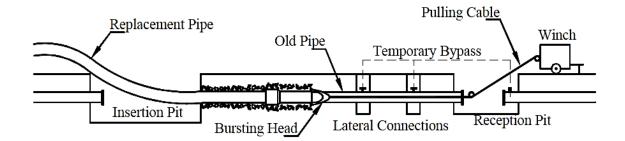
Typical Pipe Bursting Layout (Simicevic and Sterling 2001)
